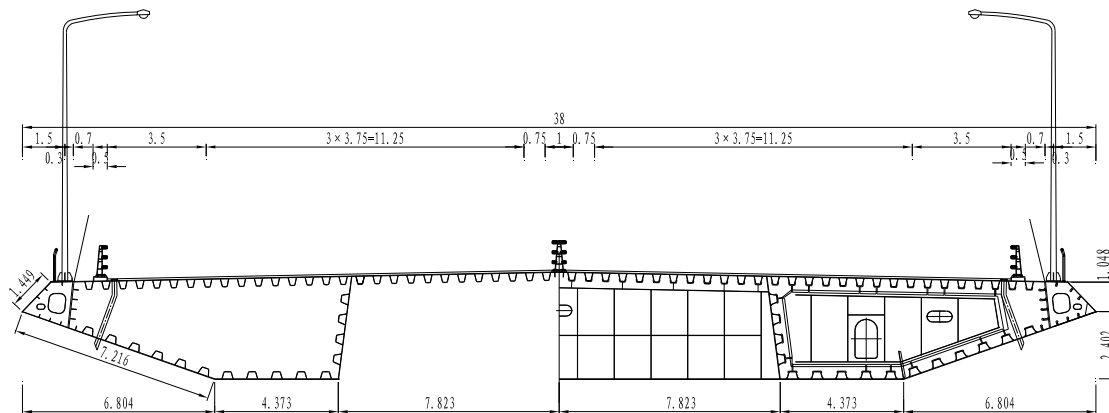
Deck cross-section of the Hubei Edong Bridge (Dimensions in m)
